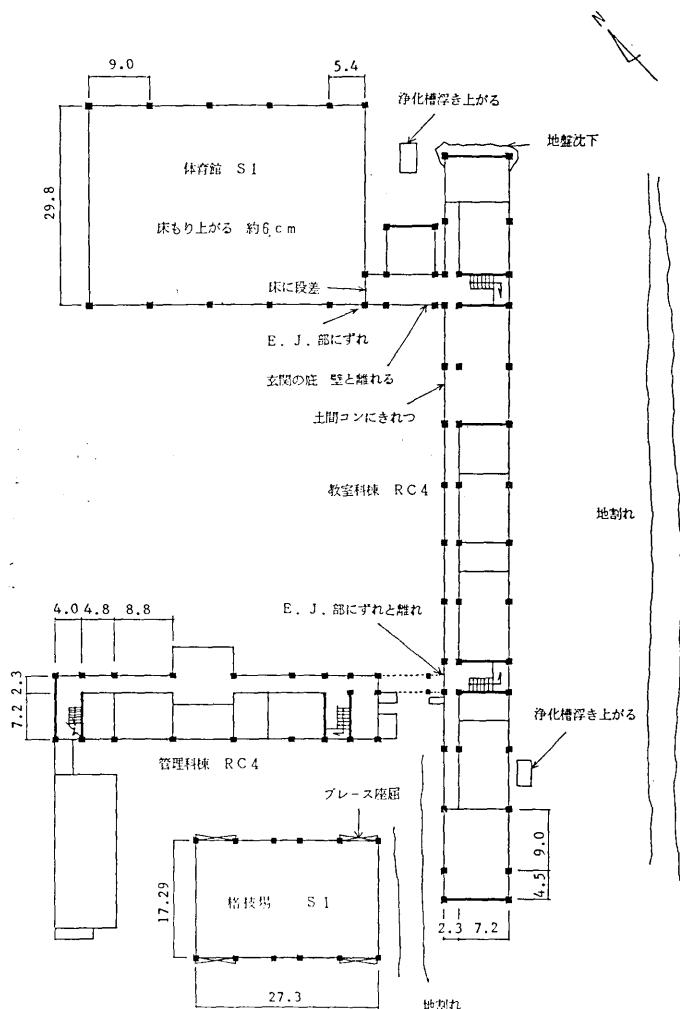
Plan and details of damage to the buildings of Noshiro Shogyo High School (Midori-cho, Noshiro city).
